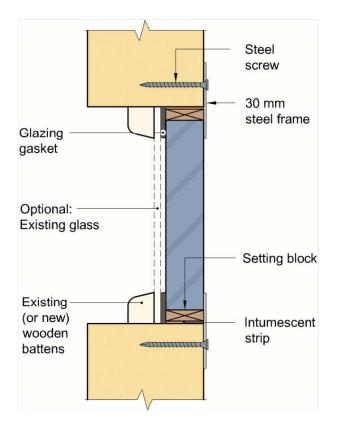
Mounting of fire resistant glass inside rabbet with steel frame on the apartment side of the door.
